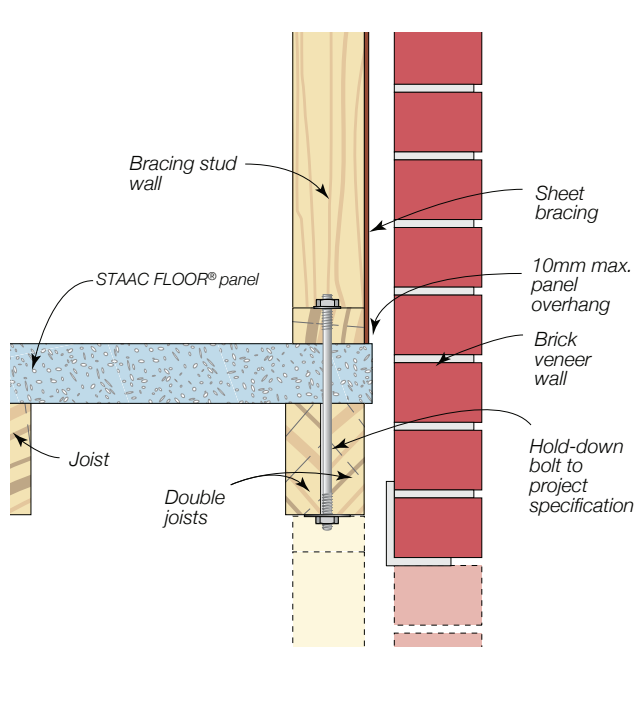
Hold-down of Internal Bracing Wall Perpendicular to Joists
